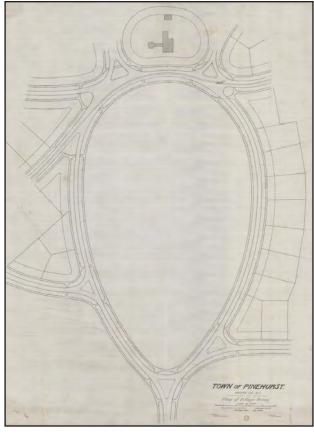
Detail view of the plan for the Village Green (#140) (Tufts Archives).
